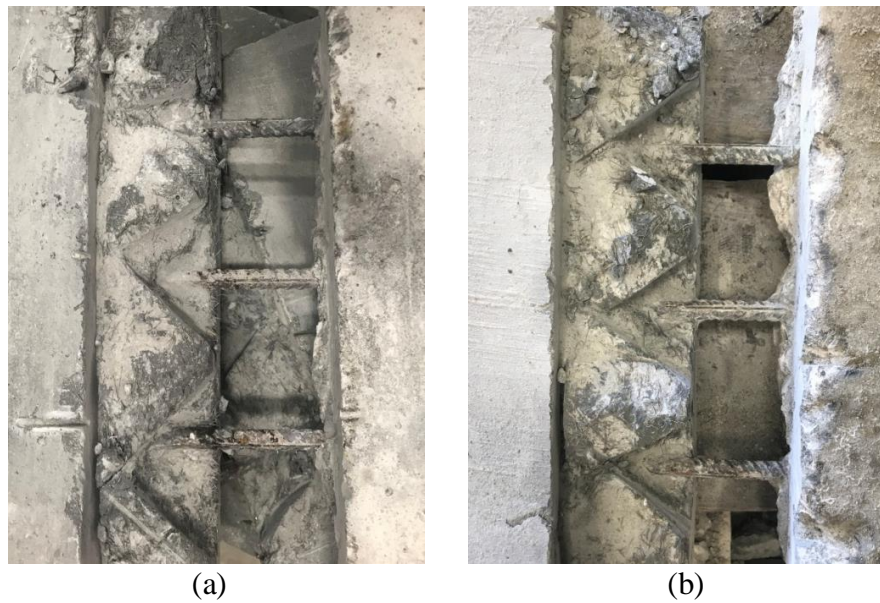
Corrosion State of Rebar Reinforcing at Joint of Ductal[®] Small-Scale Corrosion Specimens with (a) 4% NaCl (b) 8% NaCl
